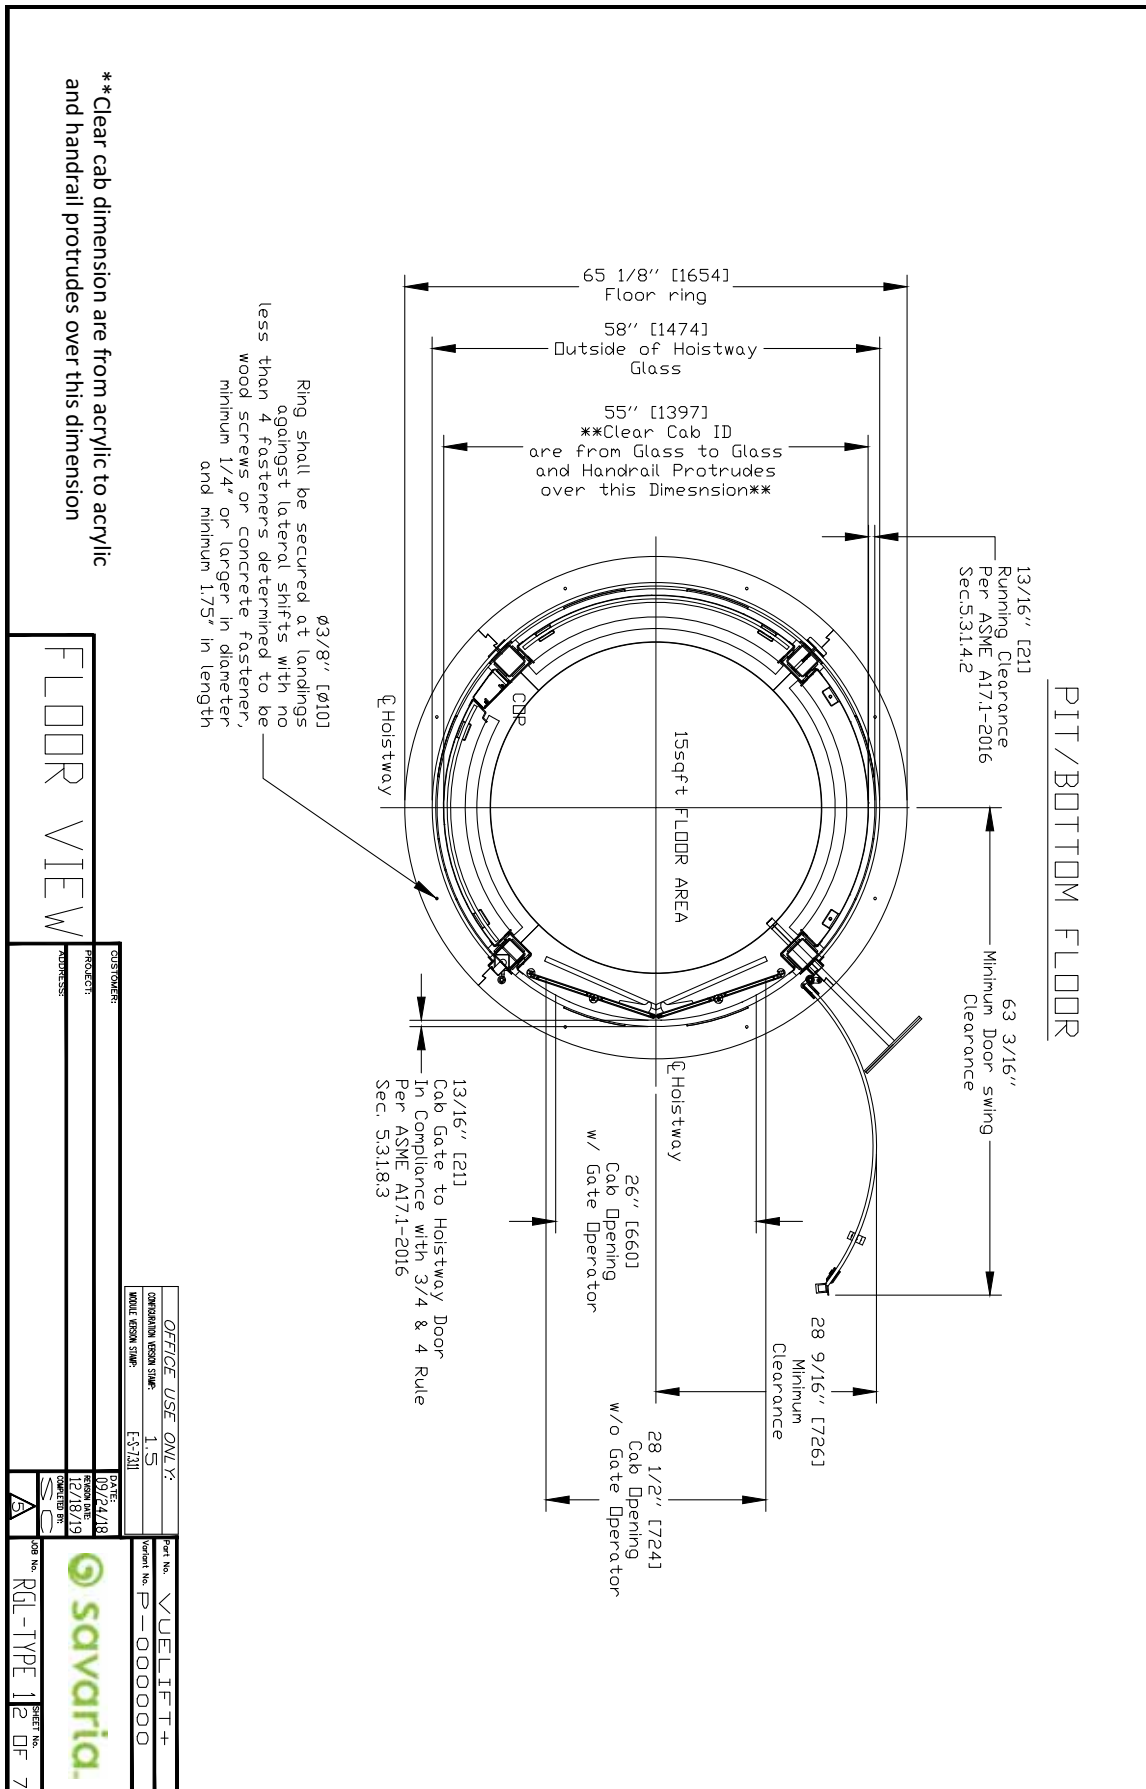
Pit/bottom floor/thru-floor view - round+ glass (RGL)
